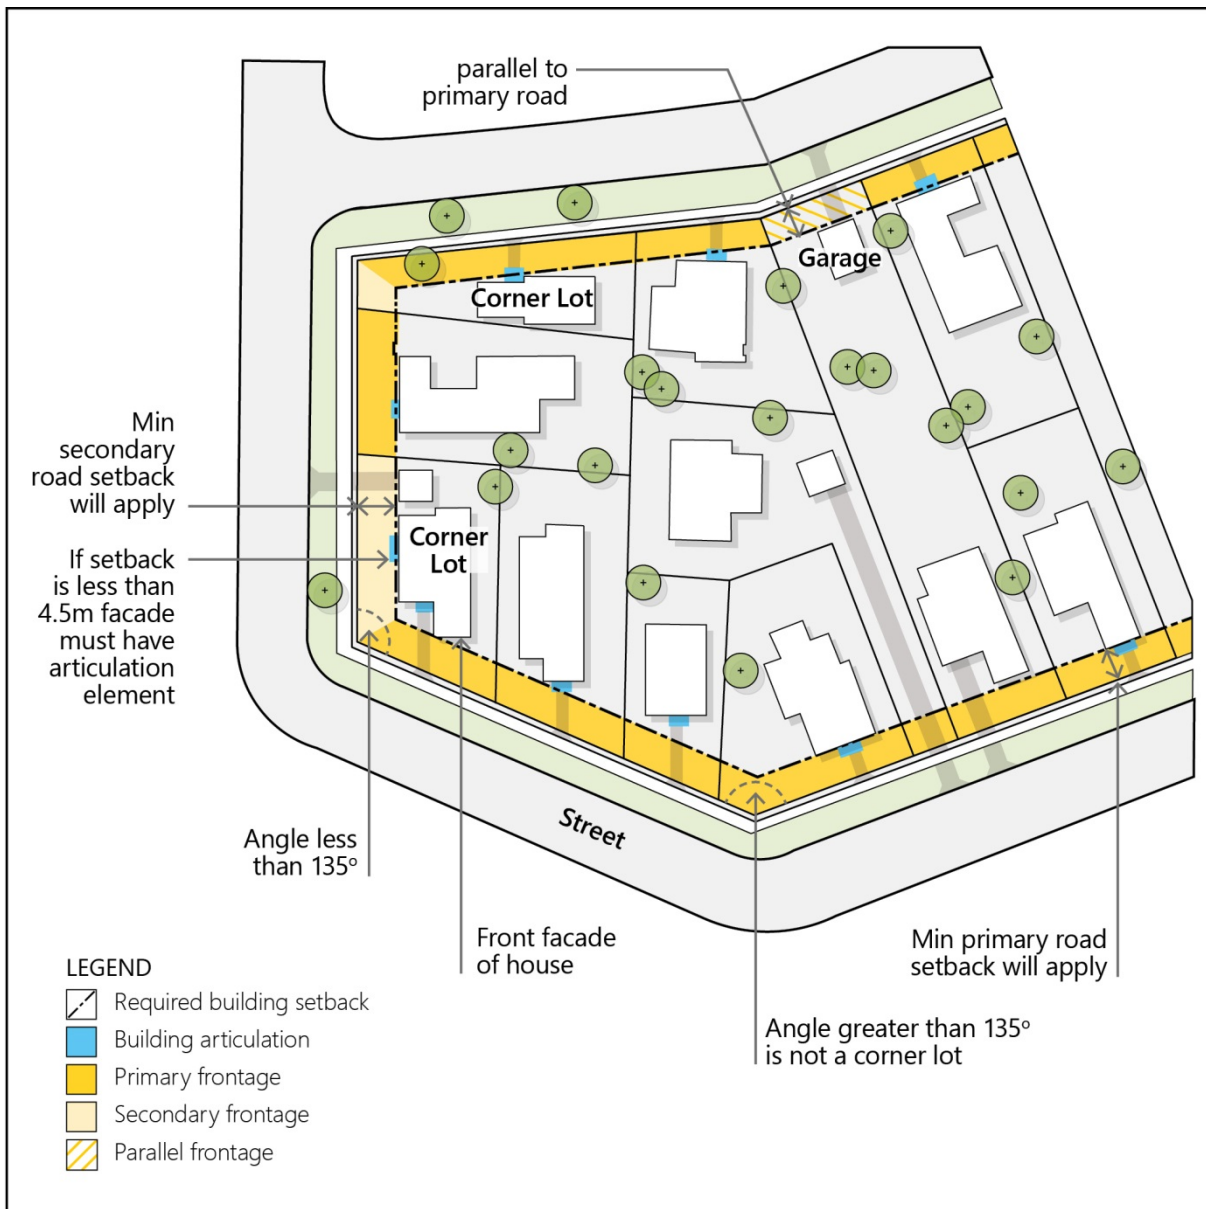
Site Layout explanation for types of Road Frontages, Setbacks & Articulation Zones
